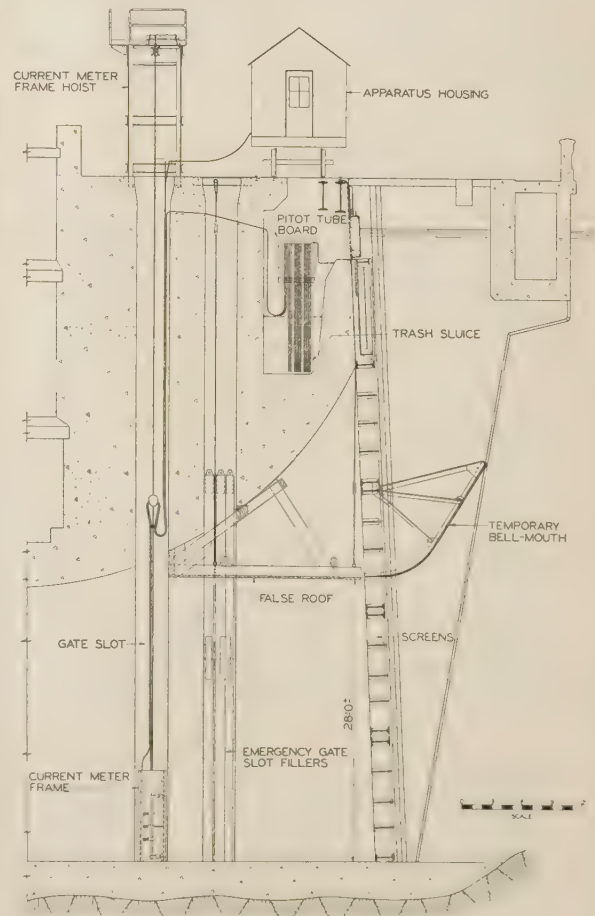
CROSS-SECTION THROUGH INTAKE WITH FALSE ROOF IN PLACE AND APPARATUS SET-UP
